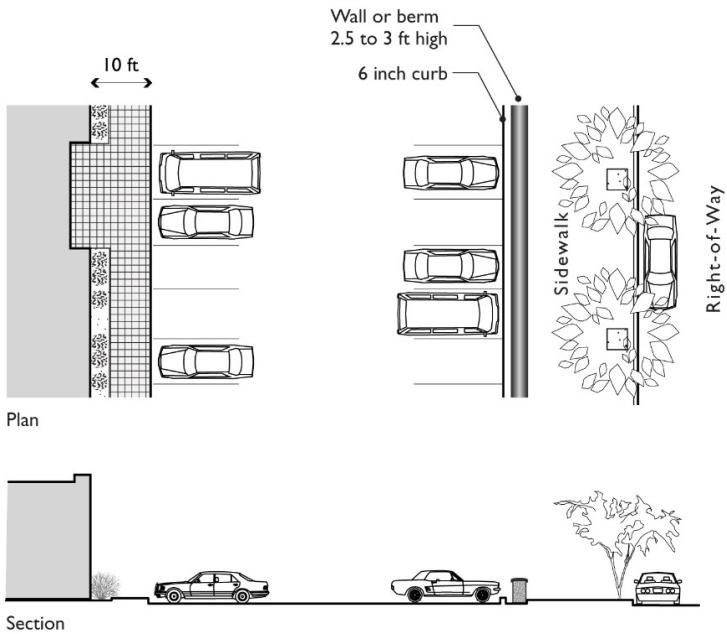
G(1): SCREENING OF PARKING AREA
